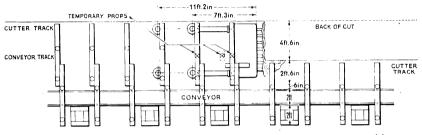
Face support system with Huwood double jack-post loader.⁽²⁾
